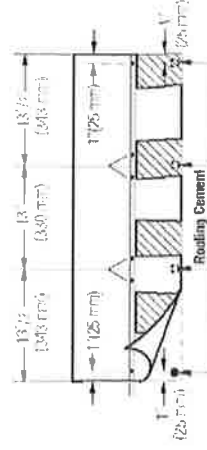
Use six nails and four spots of asphalt roofing cement on steep slopes.
